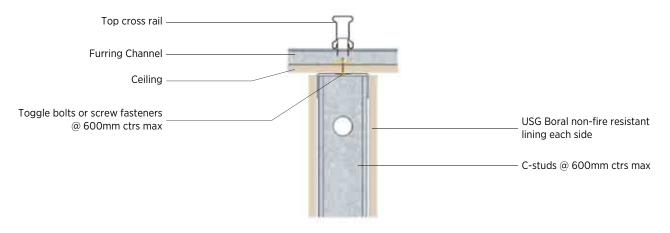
Wall Head Fixing to Suspended Ceiling Detail - Perpendicular to Furring
